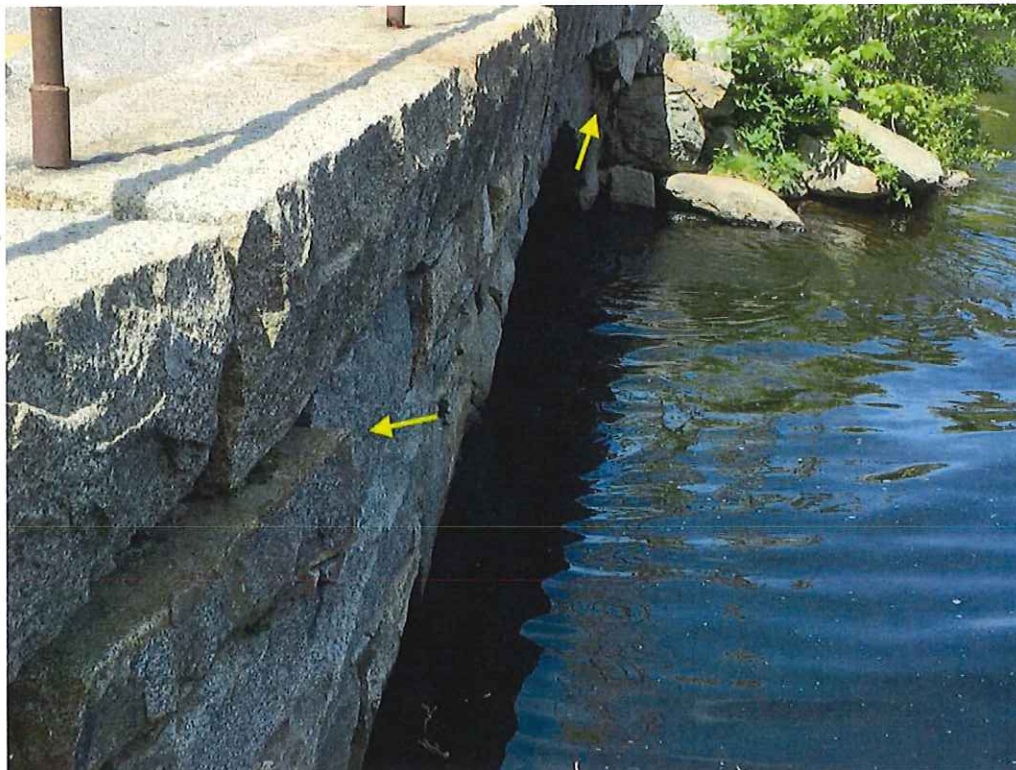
Areas of heavy settlement and depression along the north spandrel wall (heaviest at the East end) up to 1' deep. (Looking East).
